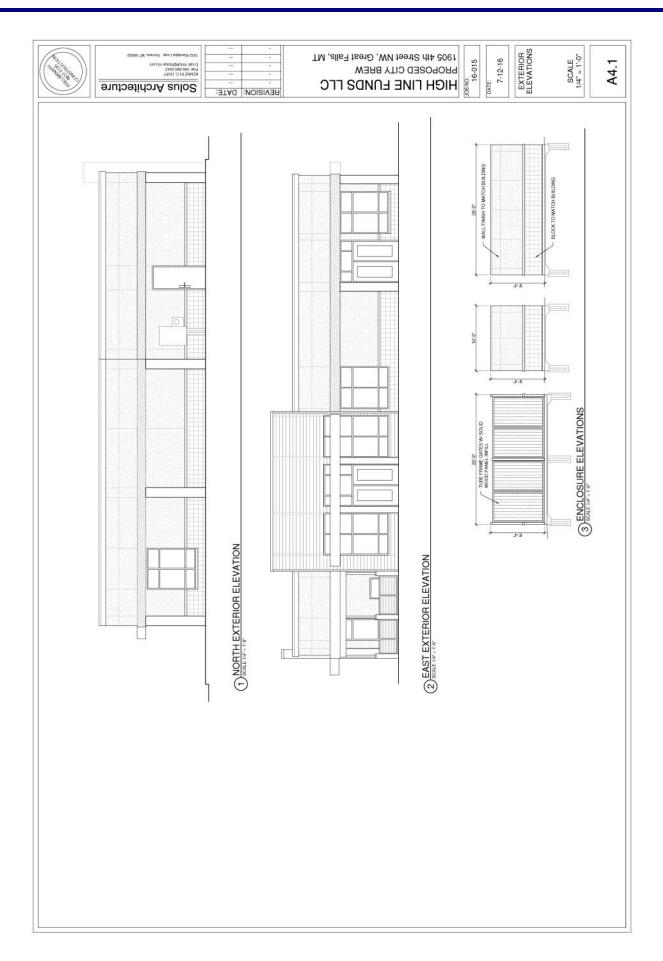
EXHIBIT G- SECTION AND ELEVATIONS (CON'T)
